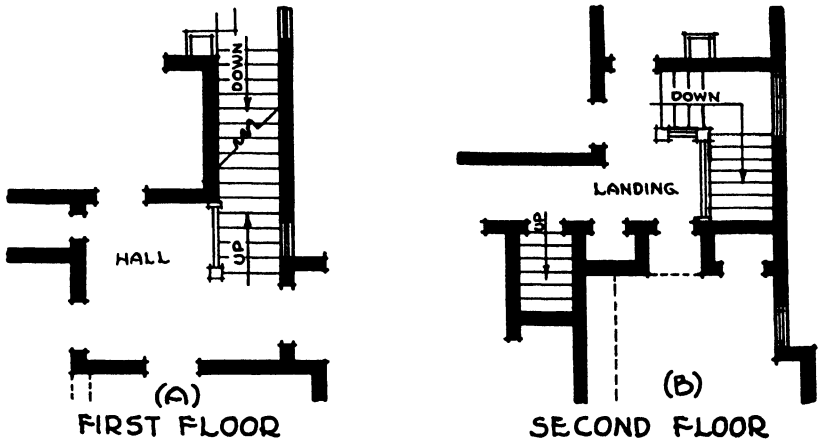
Plan of Stair Starting as Open String and Changing to Close String, with Landing Near Top
